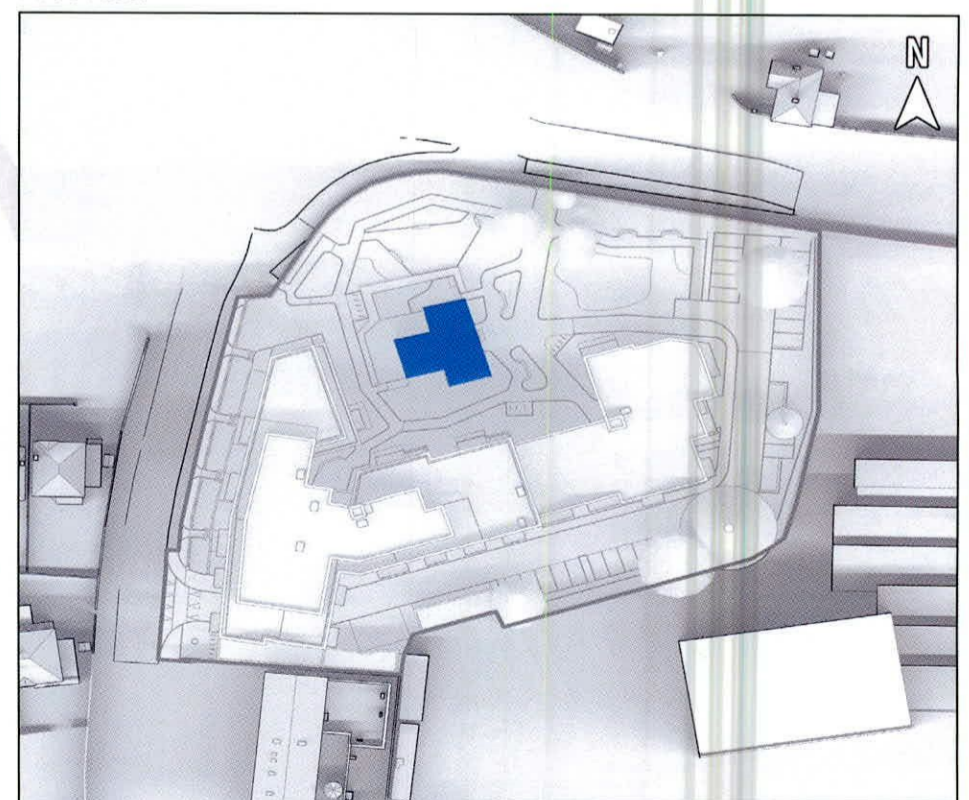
Floor plan of assessed building, Keyplan highlighting the assessed building (L).
